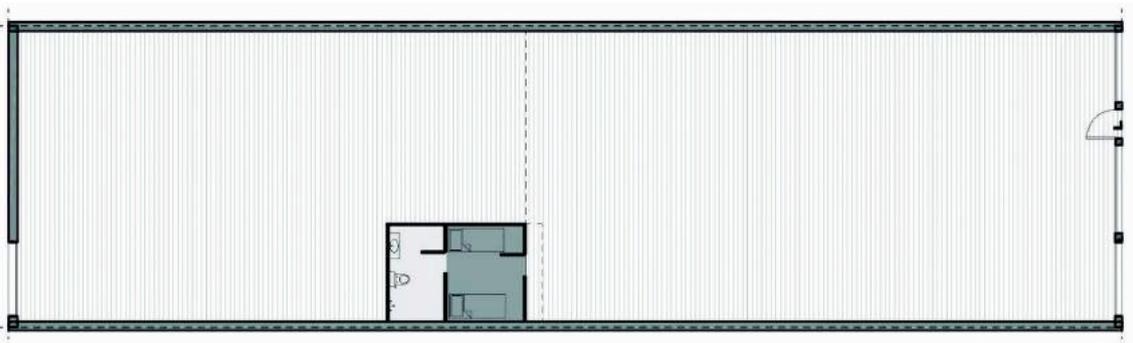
Plan 6: Familia González, Barrio San Jorge, the original dwelling, 1985. The González family have put up the original structure of the house, which consisted of a single room (marked in dark grey) and a bathroom (in light grey).
